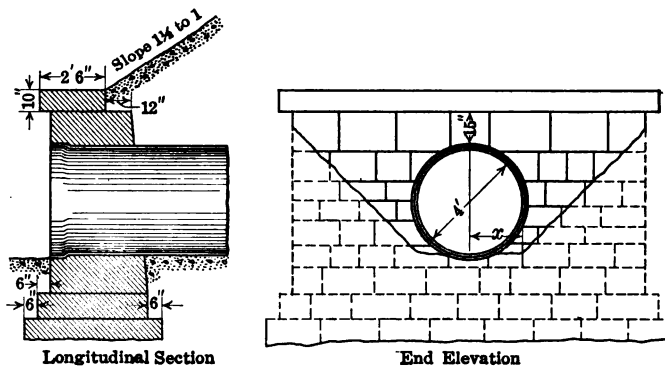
Sante Fe Railroad Standard Cast Iron Pipe Culverts.
